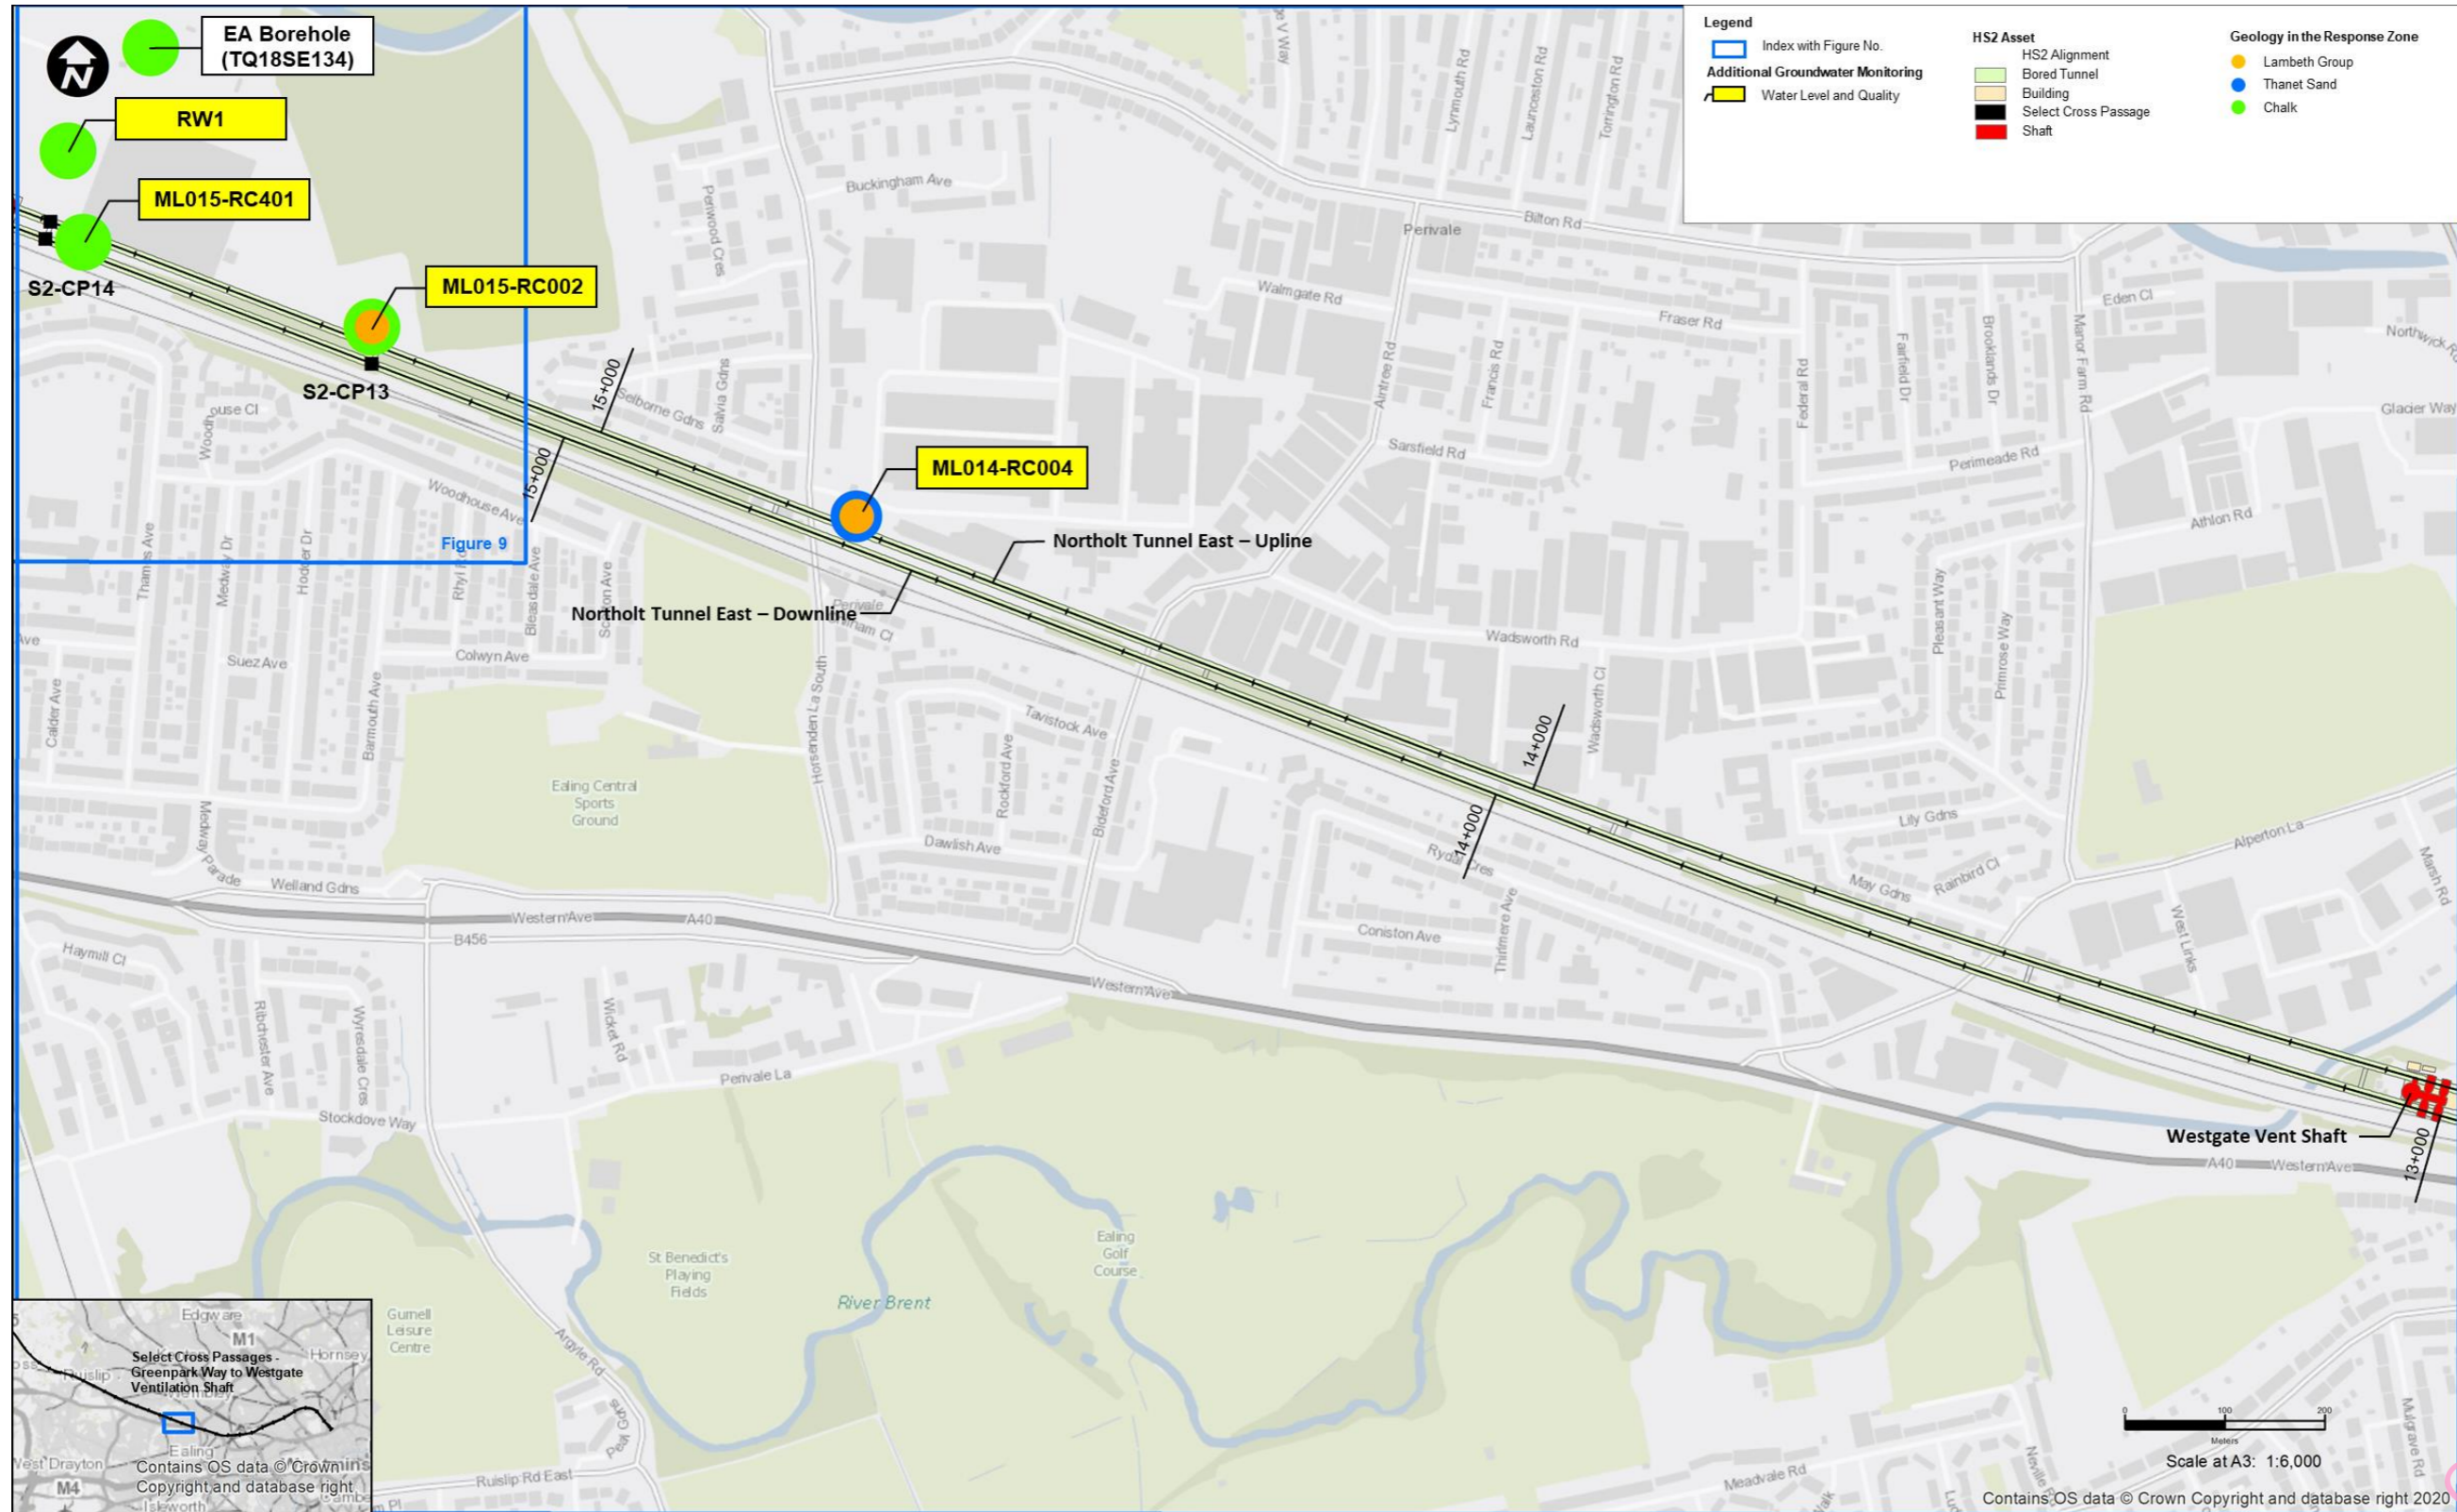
Groundwater Monitoring Plan - Cross Passages and Tunnels - Greenpark Way to Westgate Ventilation Shaft
